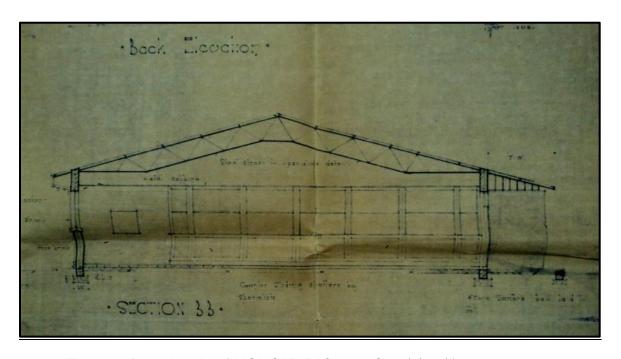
Back elevation. (NASA SAB, BAO: 4123 C167/3/505/3)
